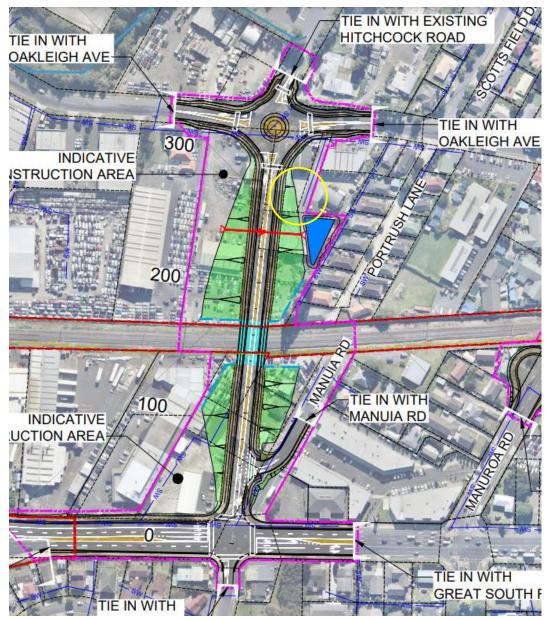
General Arrangement Plan NoR1 with location of the site highlighted in yellow (Source Auckland Transport)
